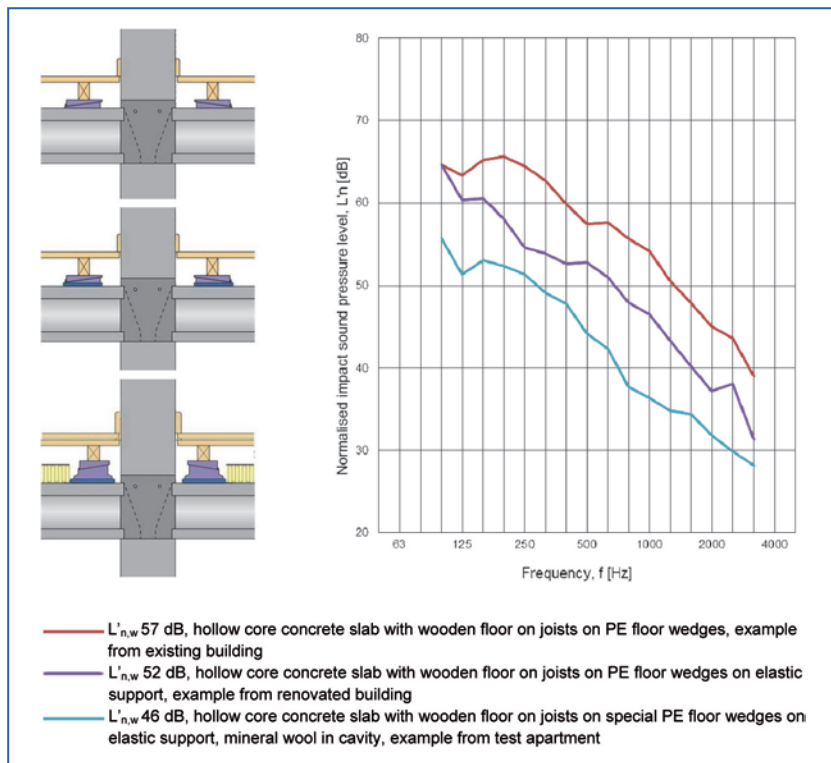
Impact sound insulation, examples from in situ measurements performed in 2012 in existing housing with hollow core concrete slabs. Two different solutions are shown of improvements of wooden floor finishes, leading to the compliance with the new Danish requirements (max 53 dB), [14].
